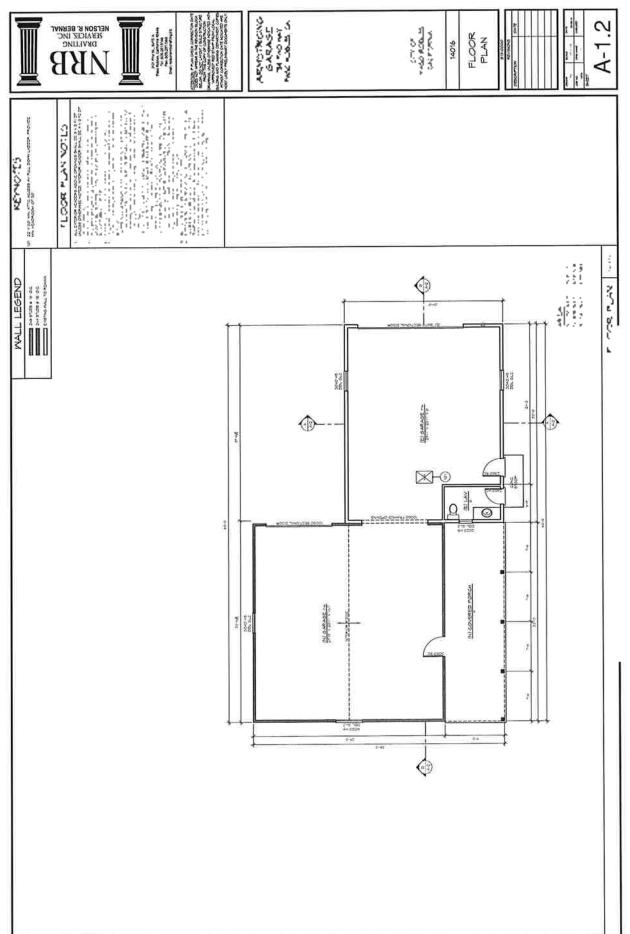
Exhibit B Floor Plan CUP 14-004 (Armstrong)
